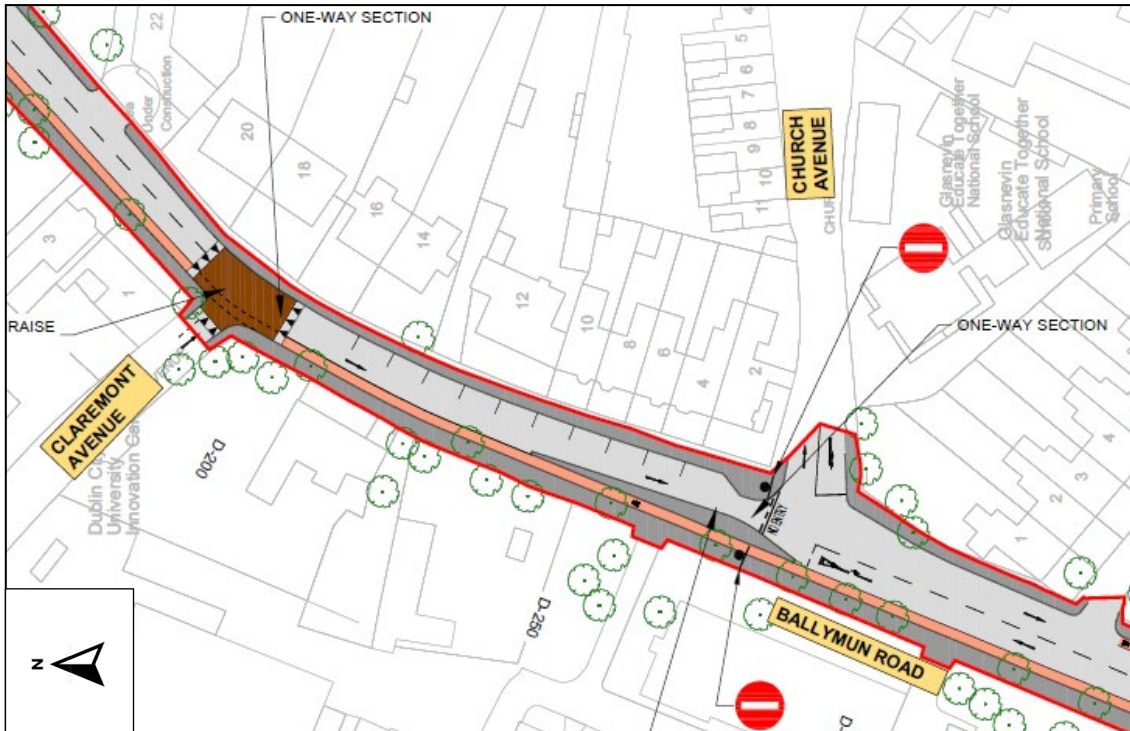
Extract from General Arrangement Drawing Sheet 20 at Ballymun Road (south)
